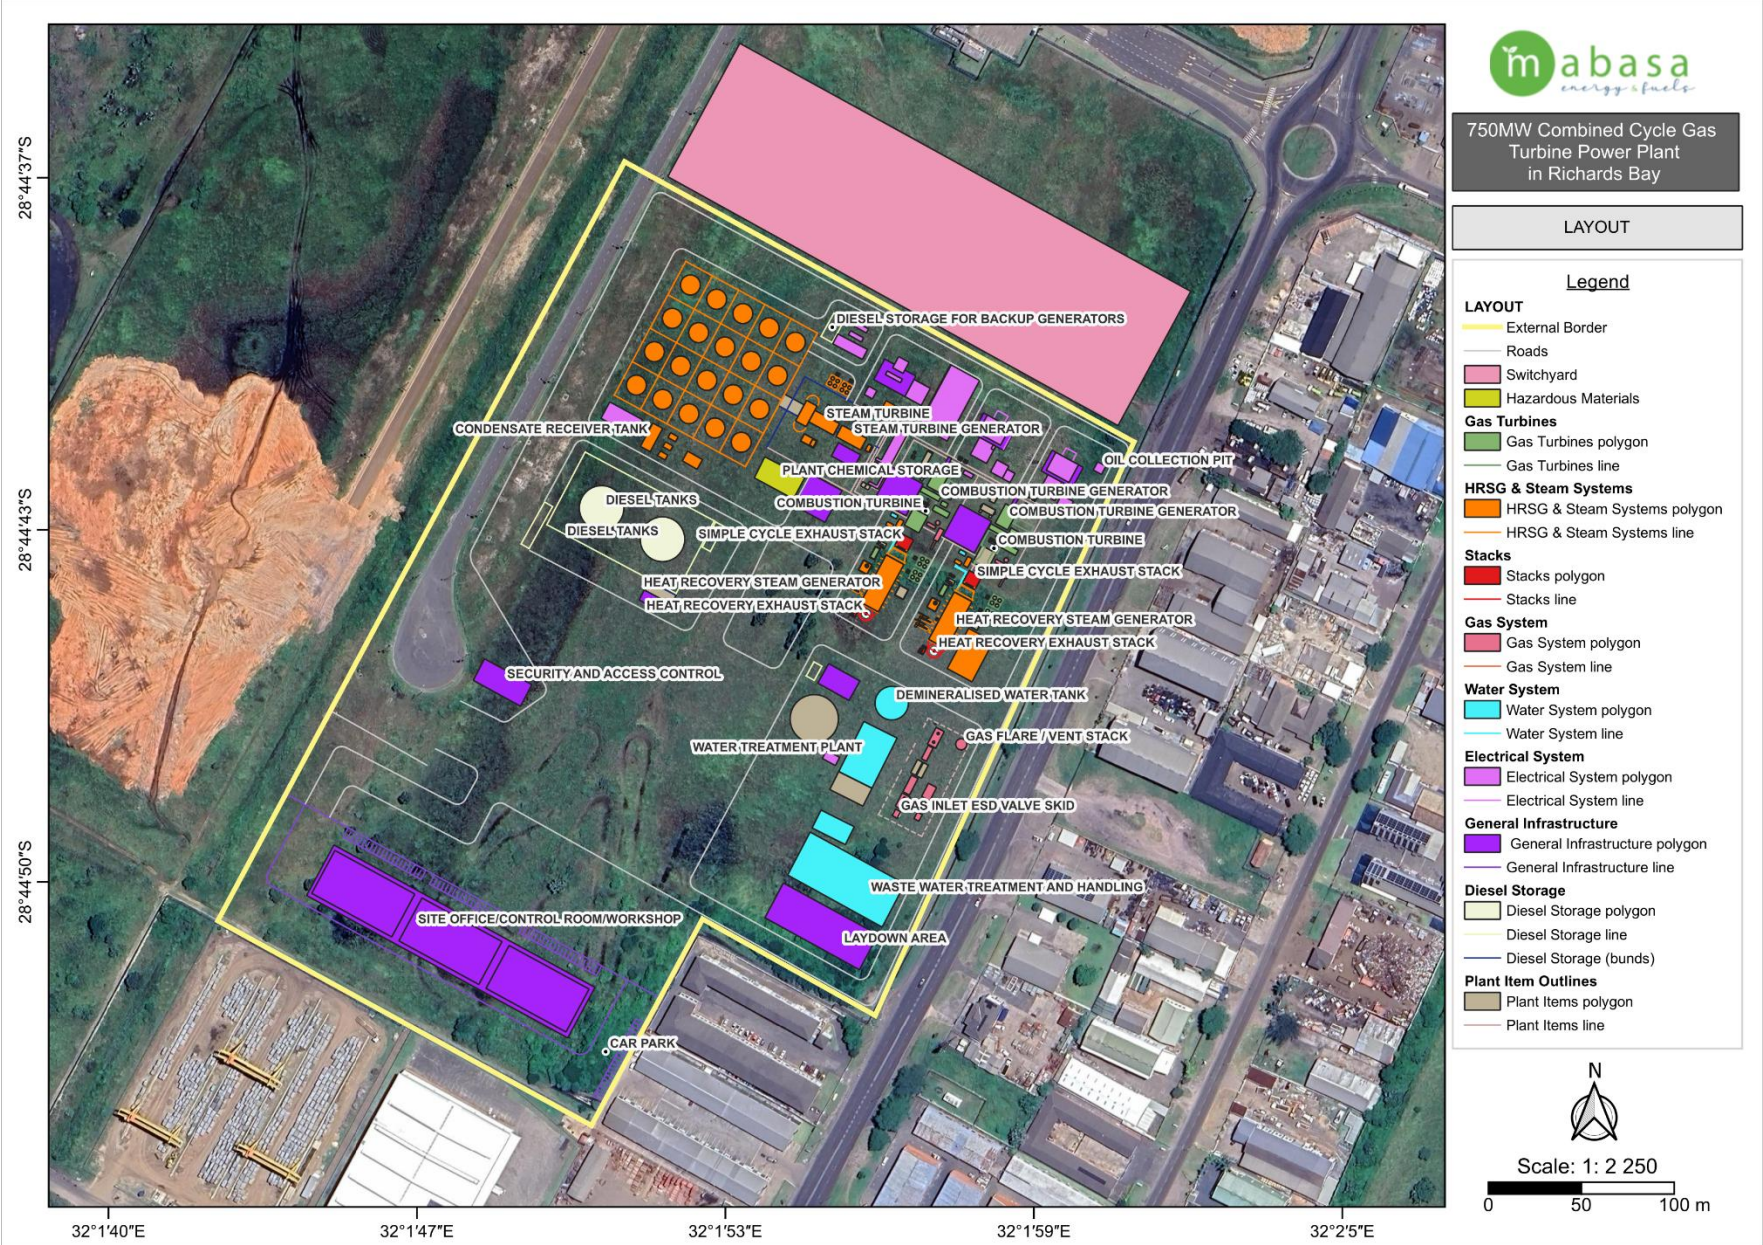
Plant layout (note: not all components labelled due to space constraints)
